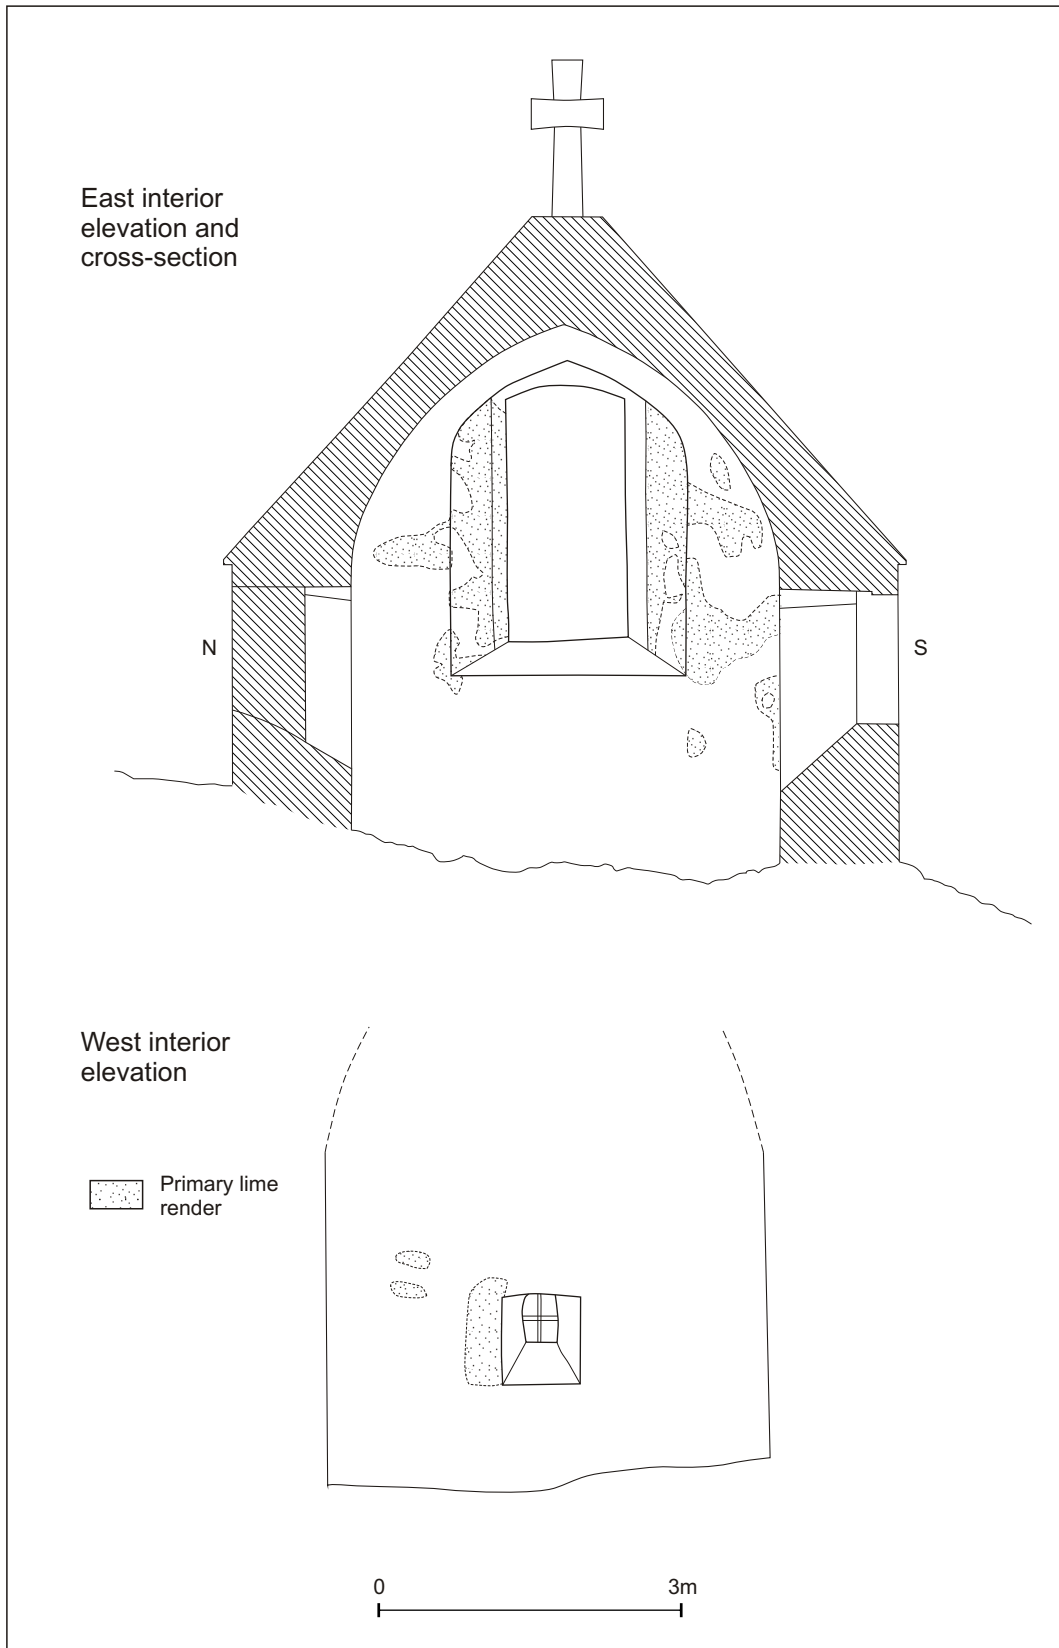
St Michael's Chapel, Torre, east and west interior elevations measured drawings
